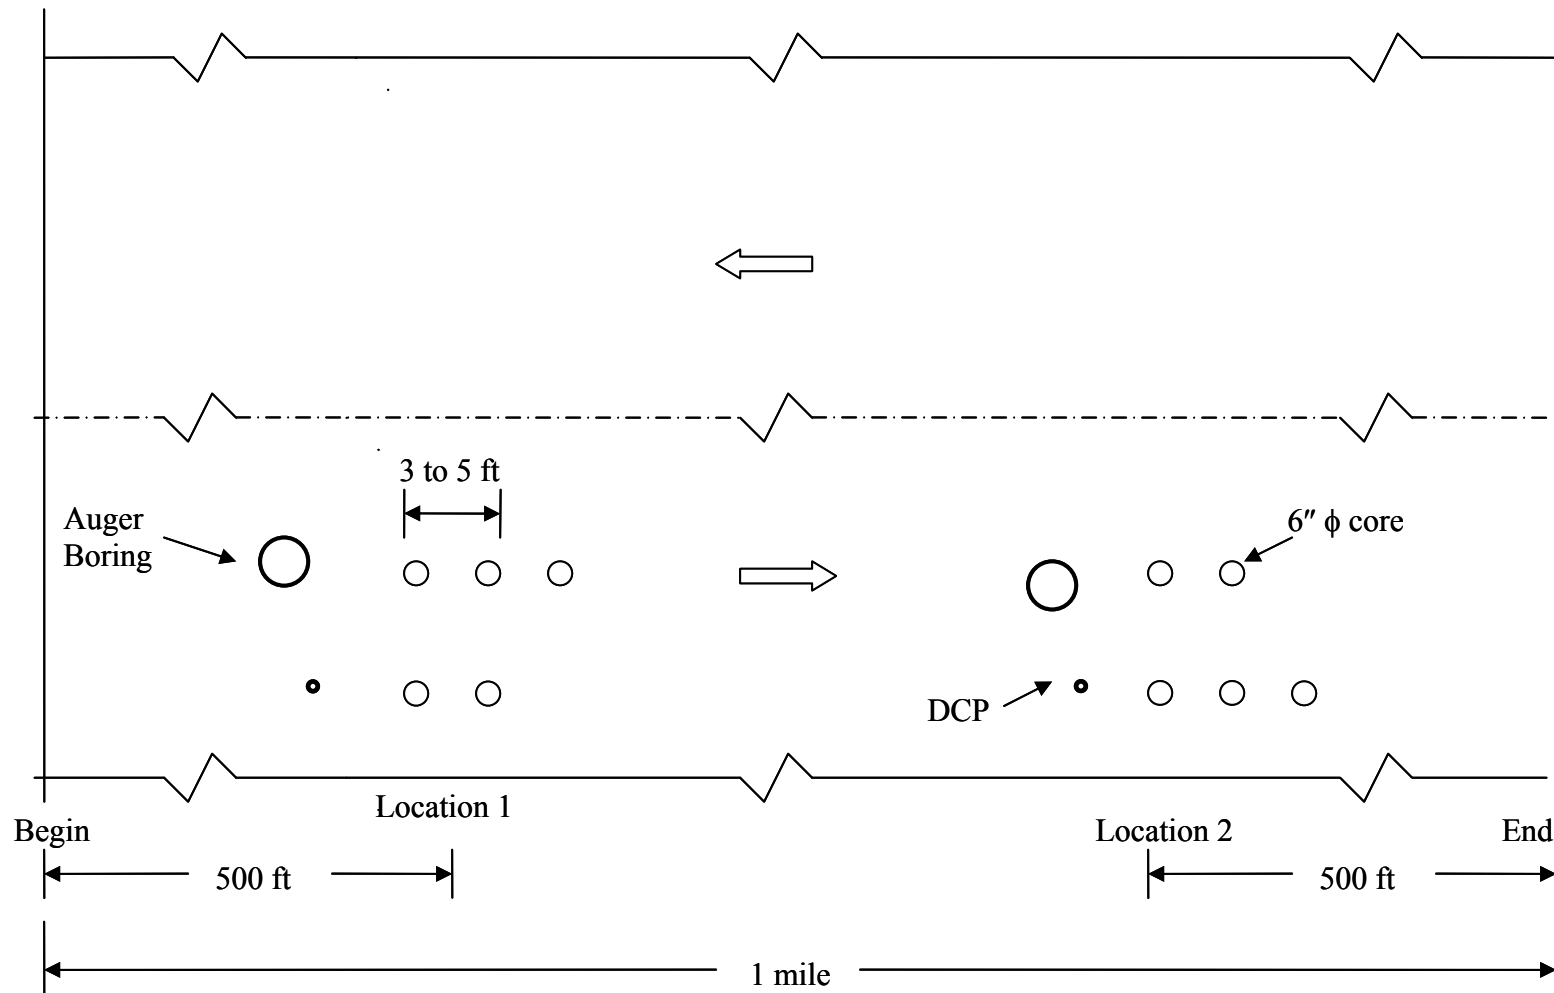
Typical Sampling Layout -- Pavements with Asphalt Concrete Mixture Layer(s).
